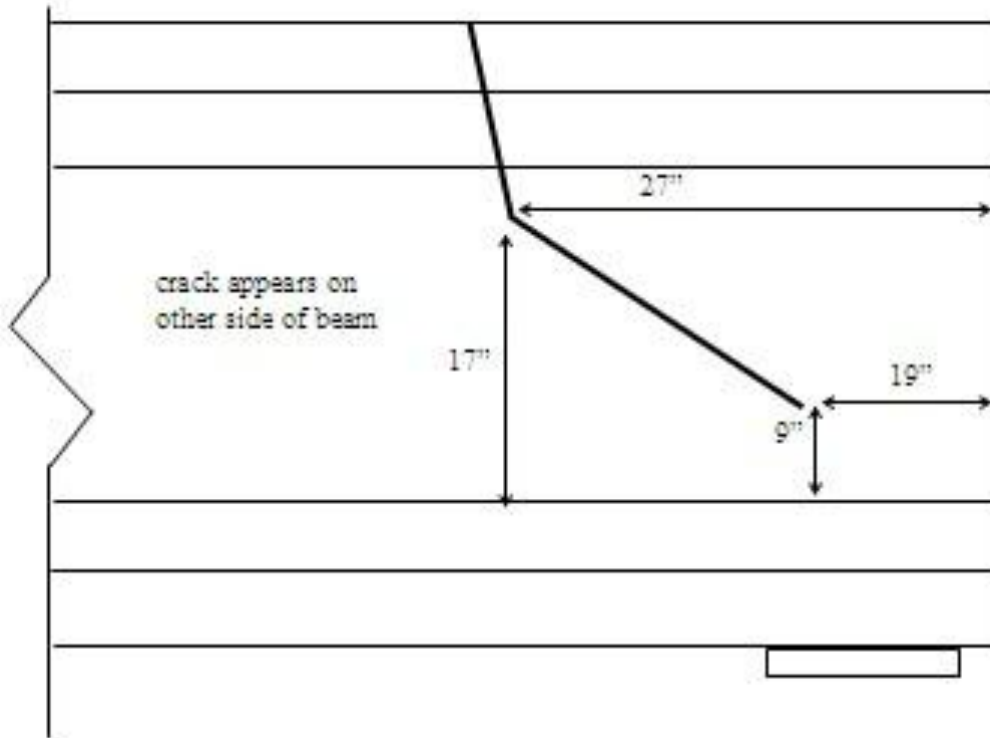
Crack diagram for south span girder, 3rd from east side, west face, south abutment (#7933).
